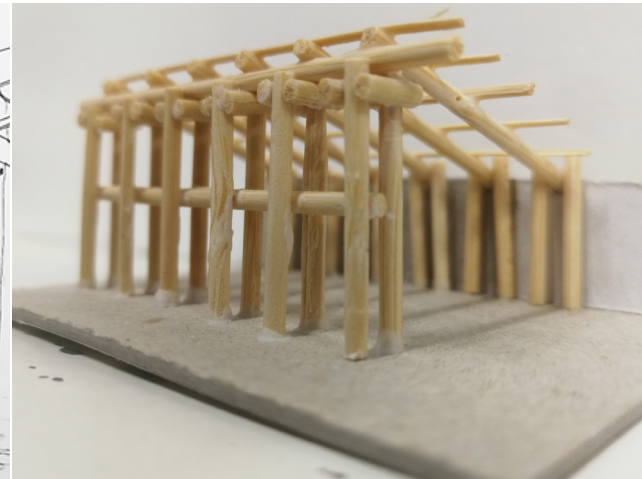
Plan B exterior Primary structural model (Author, 2021).
